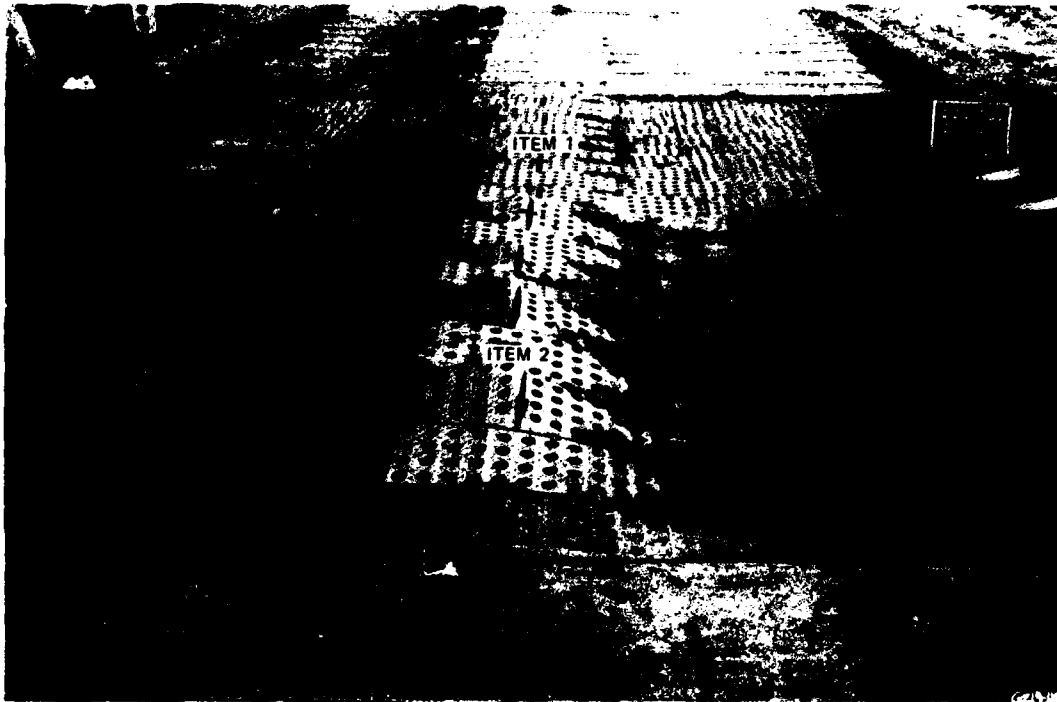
General view of test section showing item 2 failed after 158 passes (25 tank and 133 truck passes), test II
